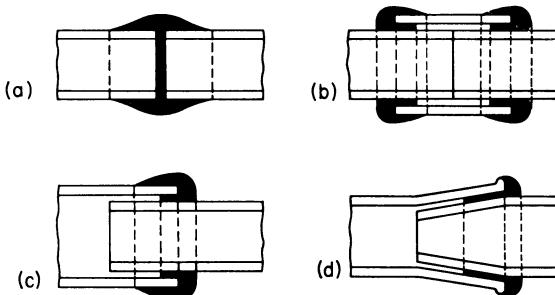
Methods of joining pipes by waxed seals: (a) butt joint; (b) butt joint with sleeve; (c) telescopic joint; (d) conical joint
